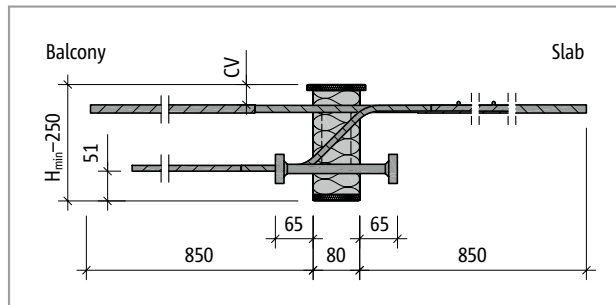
Schöck Isokorb® T type K-M12: Product section
